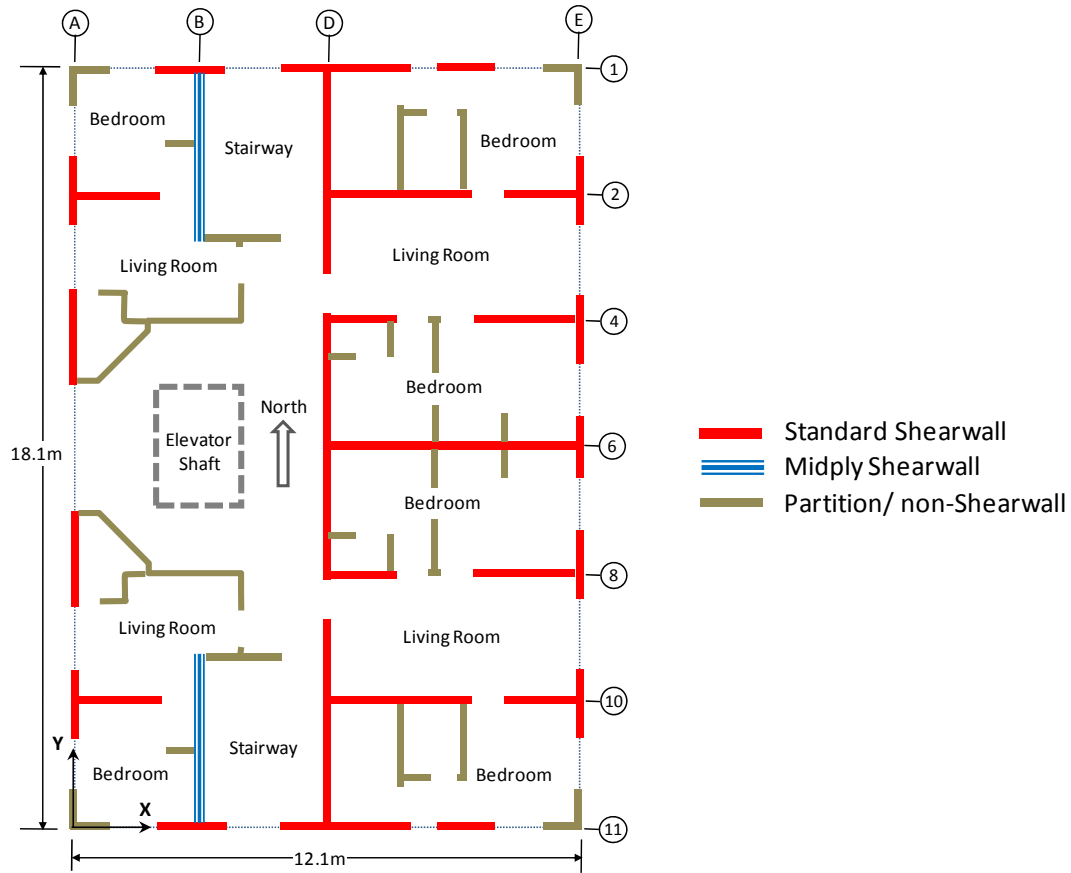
Plan view of the six-story NEESWood Capstone Building for 1st floor.
